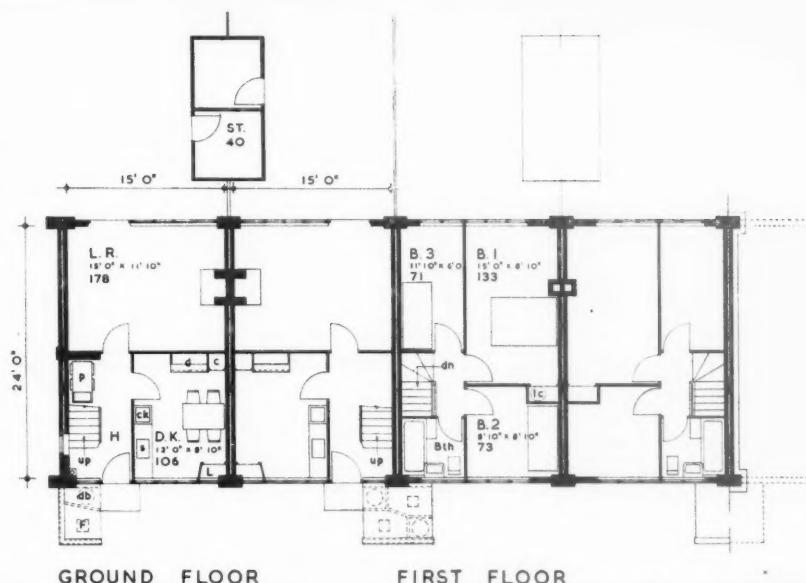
One of three type plans of crosswall construction houses in the exhibit of the Ministry of Housing and Local Government
